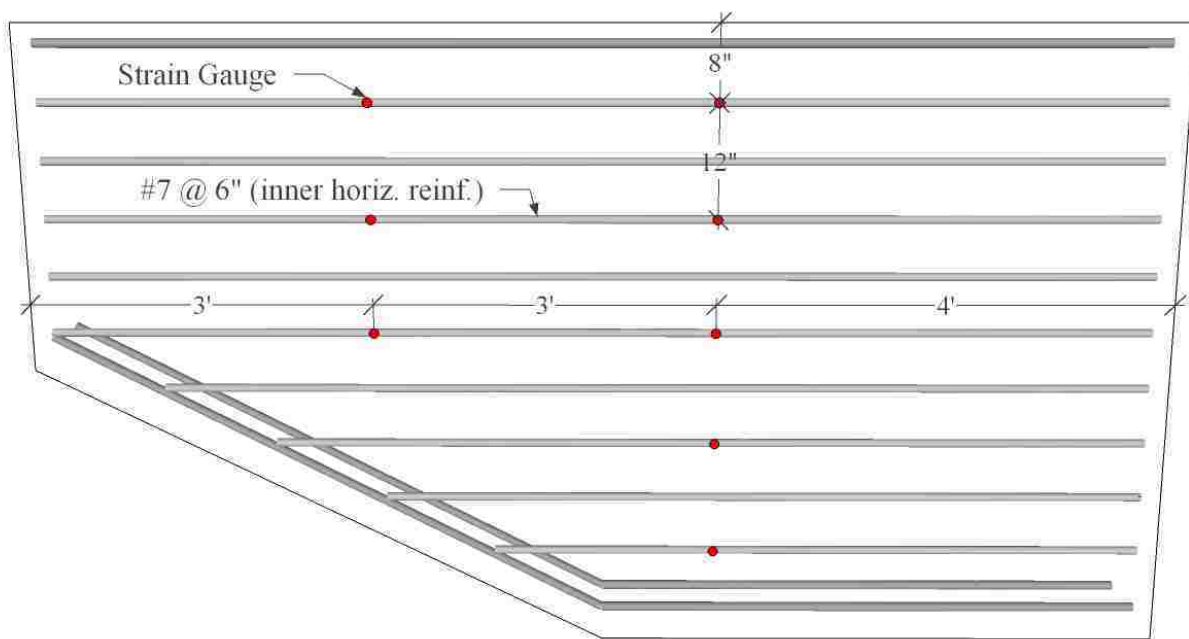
Wingwall strain gauge layout—same for both wingwalls.
